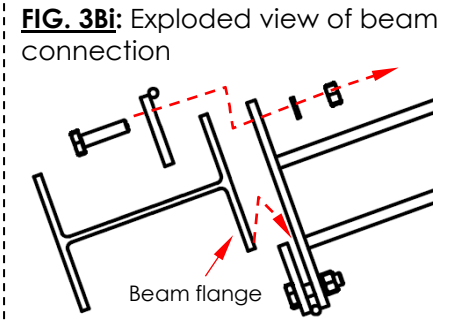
Bii: Exploded view of beam connection (FHSN-6-20 & FHSN-8-20)
